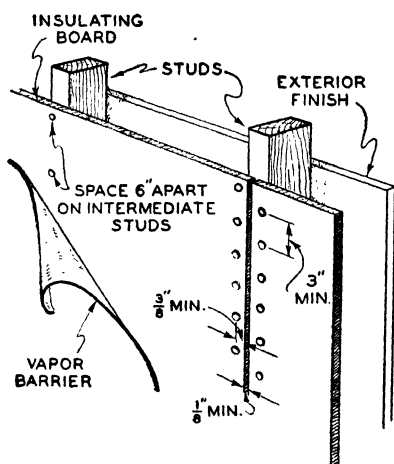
Interior View of Frame Wall Showing Method of Applying Insulating Board
